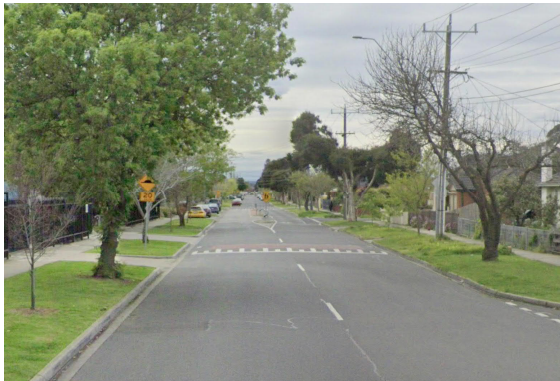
Darnley Street (facing north adjacent the proposed site access)
